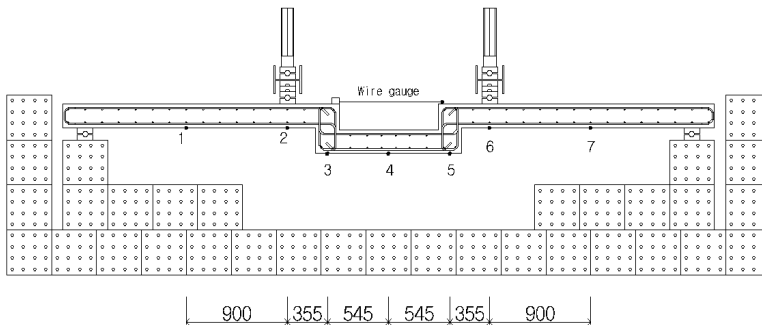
Installation drawing of LVDT and wire gauge
